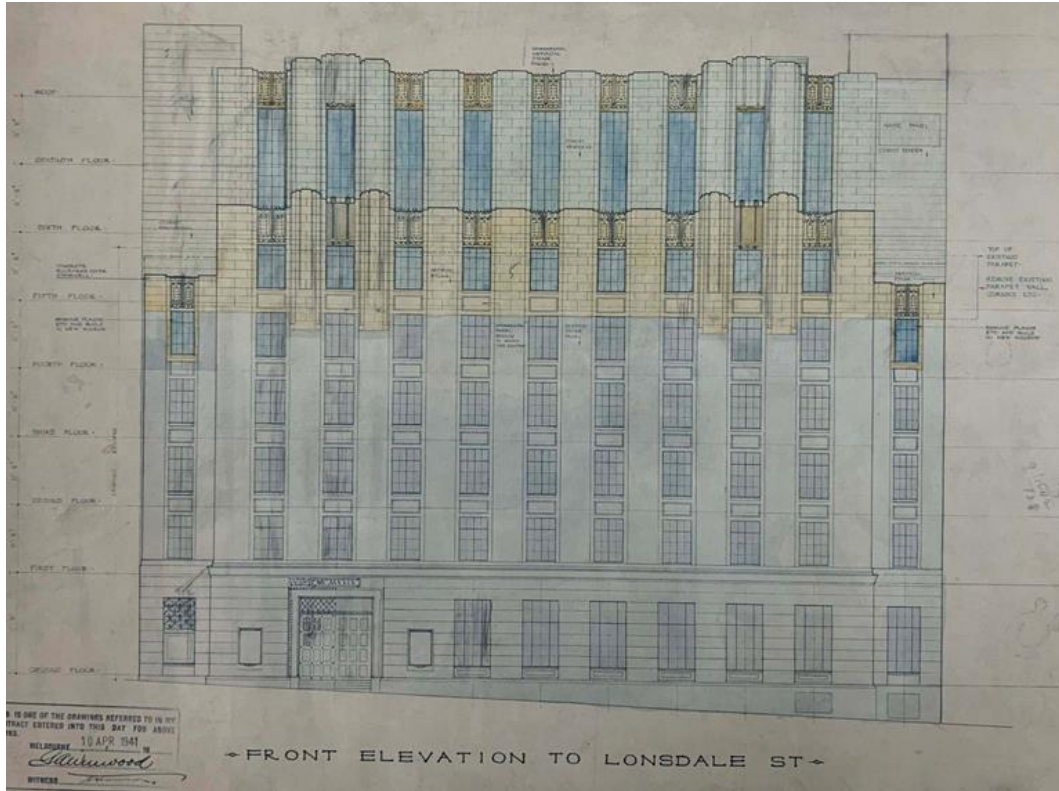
Taxation Offices, Lonsdale Street, drawing of new façade, 1941
